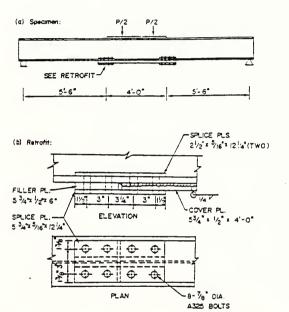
Test Specimen with Retrofitted Cover Plate Ends. (Sahli, Albrecht, and Vannoy (1984))
